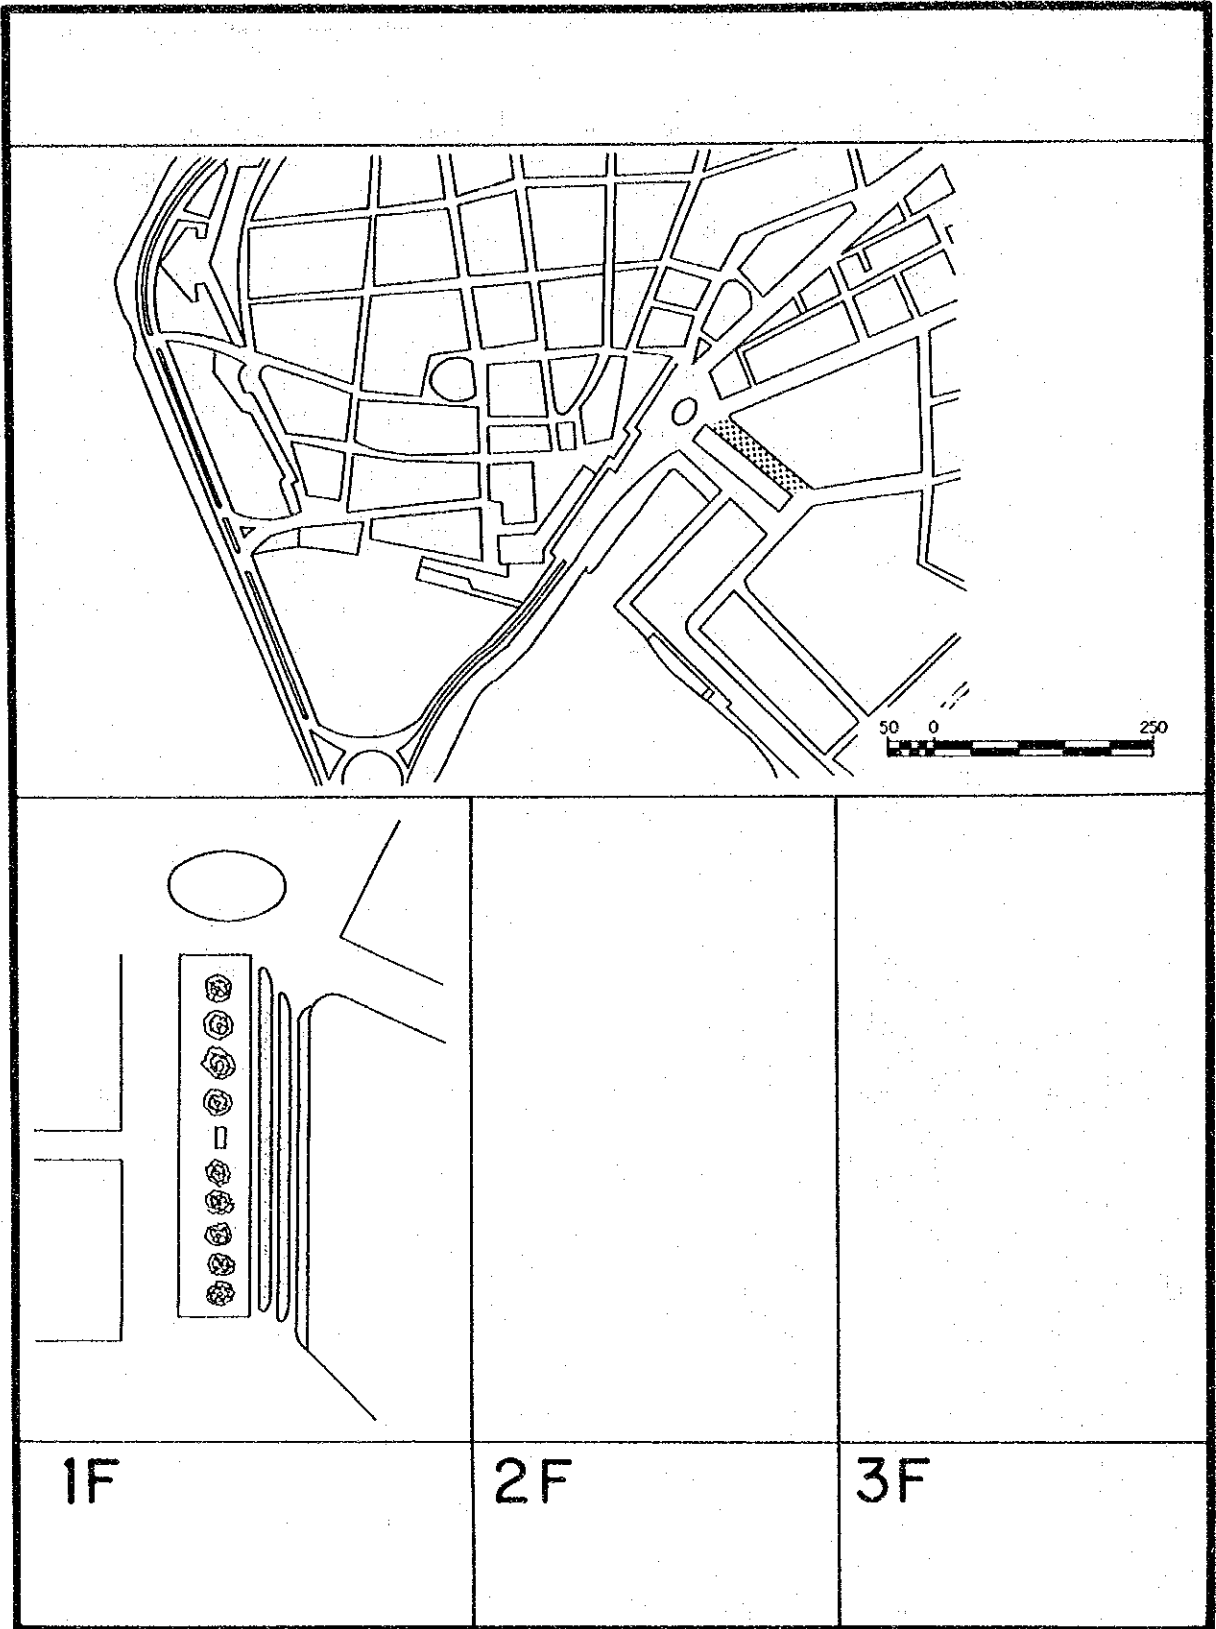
Bus Terminal Plan in Parque Centenario
